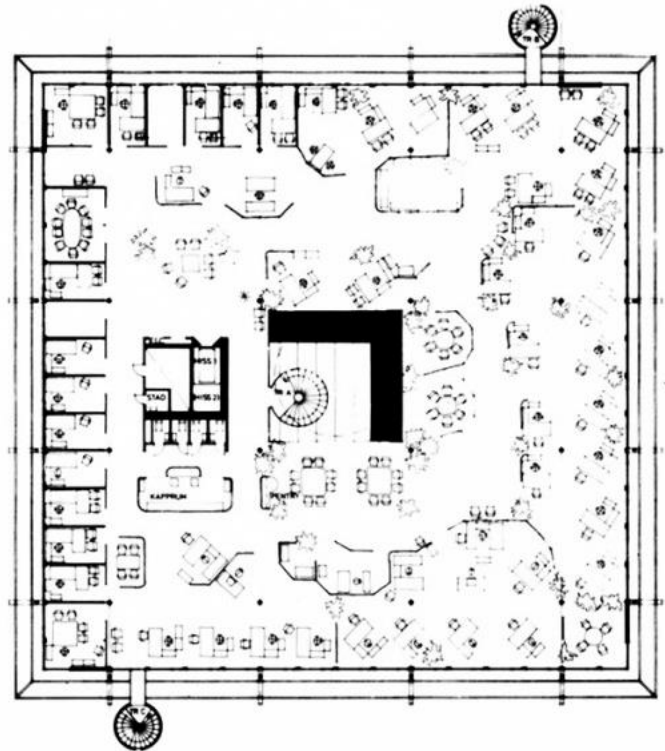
Floor plan of headquarter of Canon in Satra, 1978. Source: Tengbom Arkitektkontor (1982)
